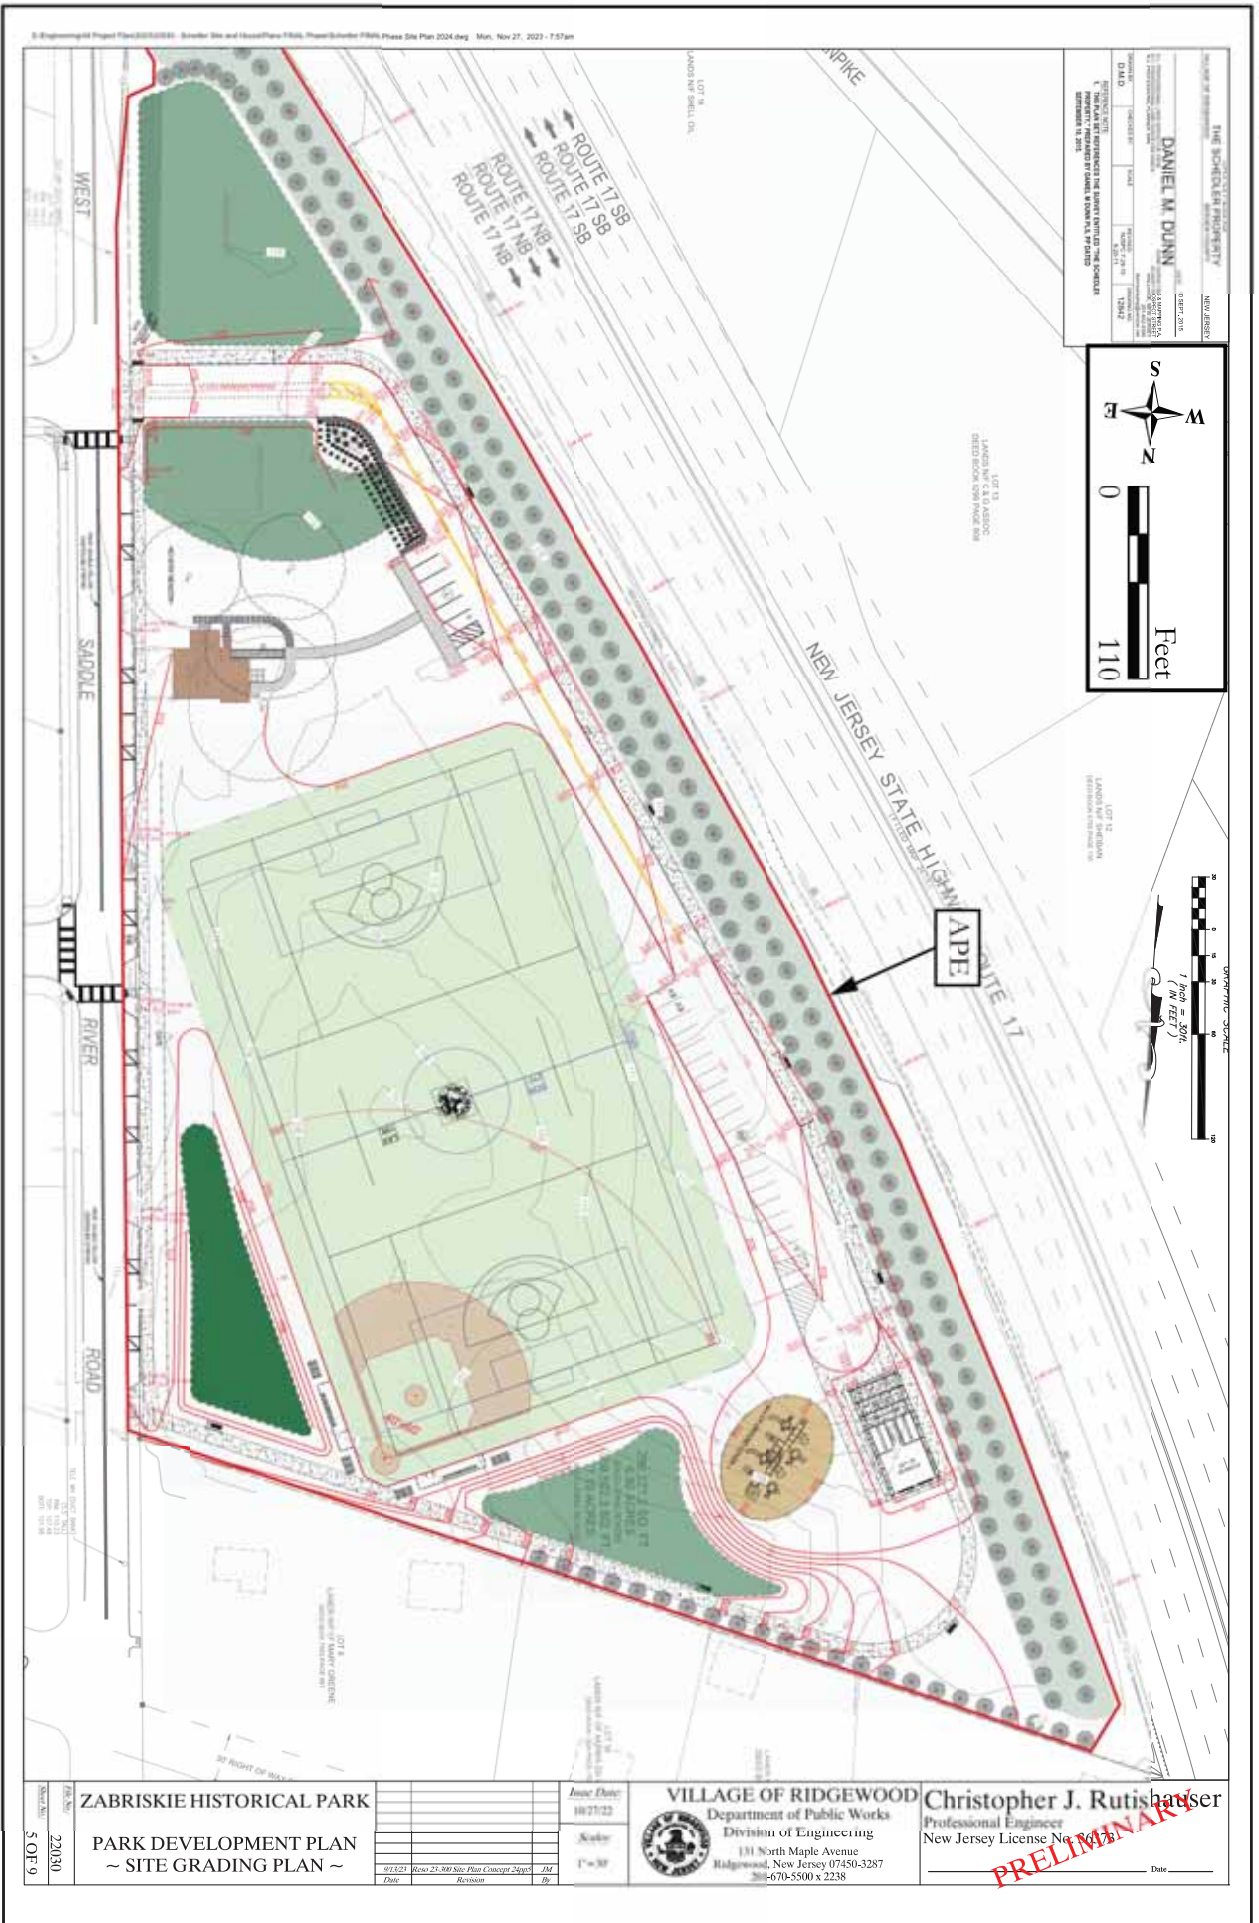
Site Grading Plan, Zabriskie Historical Park
